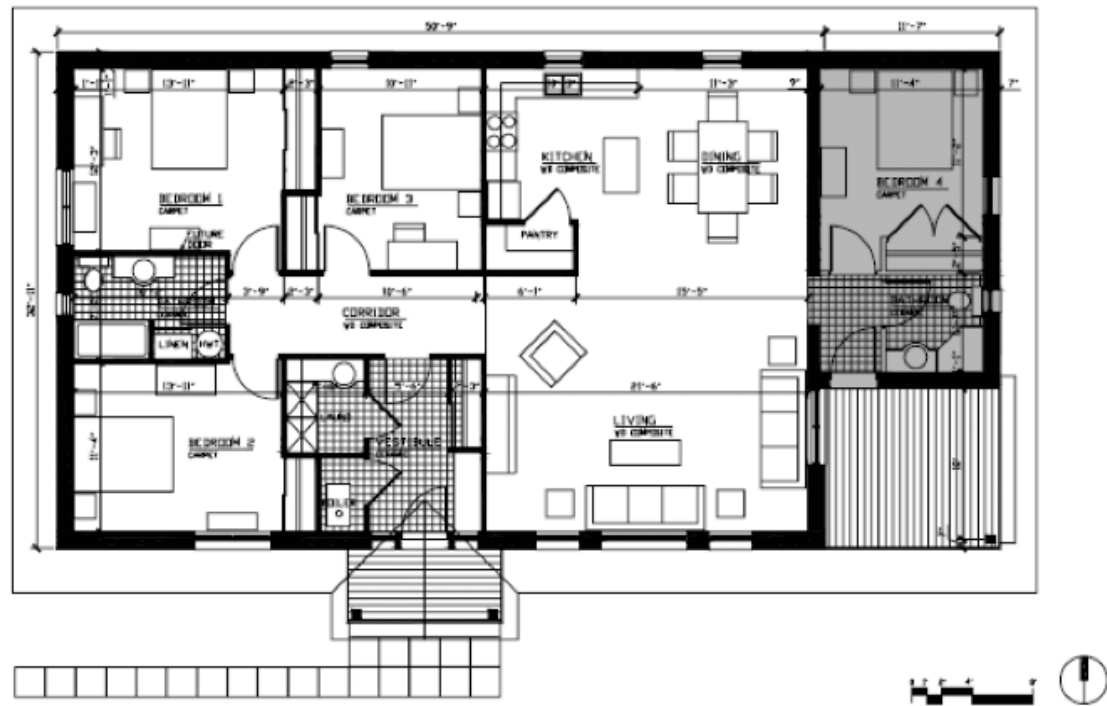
Floor Plan of the Dawson City Northern Sustainable House (Semple, 2007)
